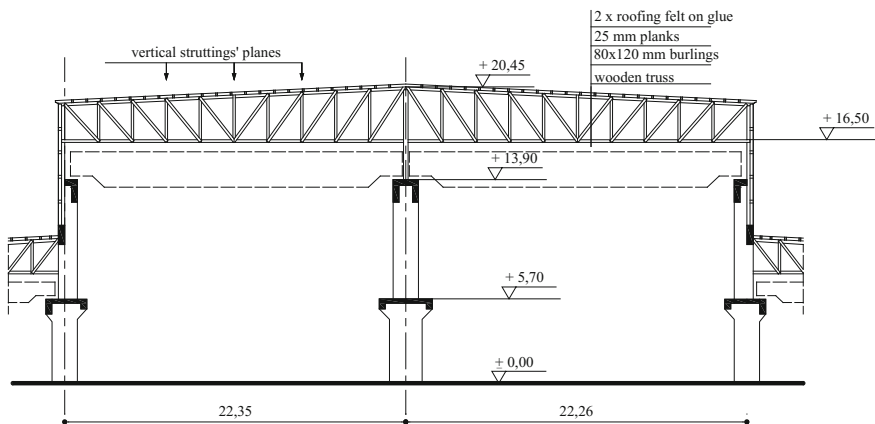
Cross-section of the wooden roof according to [18] on which the steel roof fell
